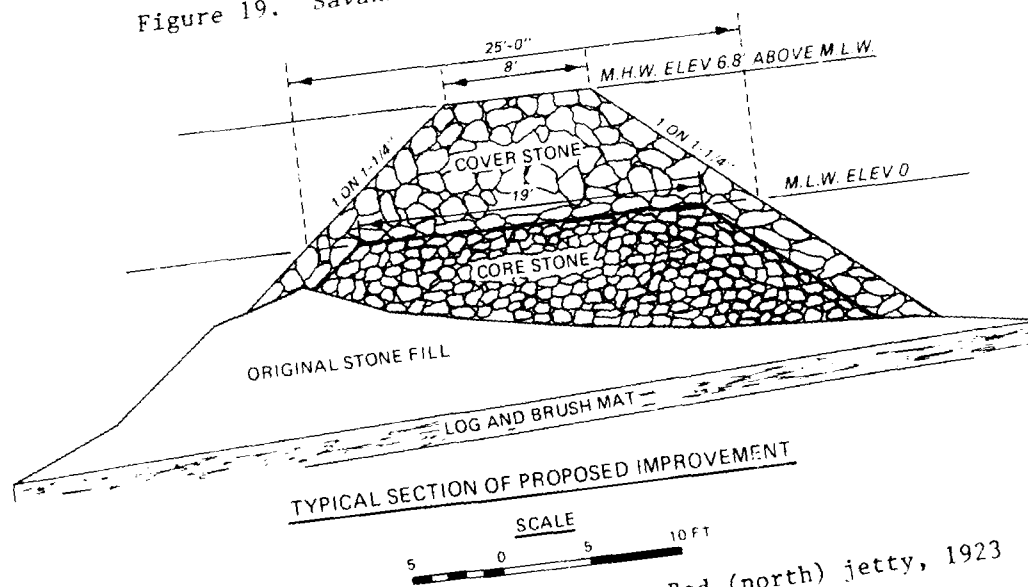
Design cross section, Oyster Bed (north) jetty, 1923
